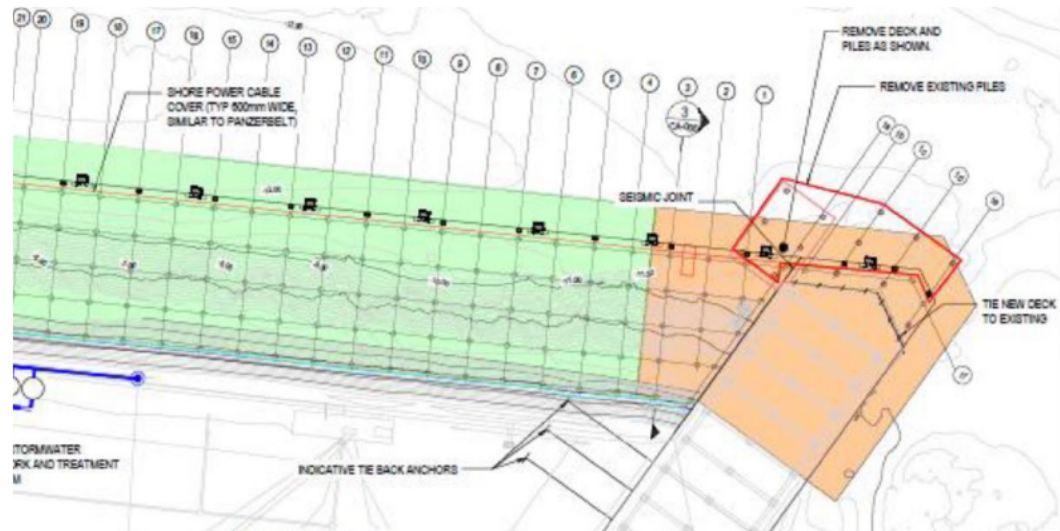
Piles and deck at north-east corner of Bledisloe Terminal to be demolished.
